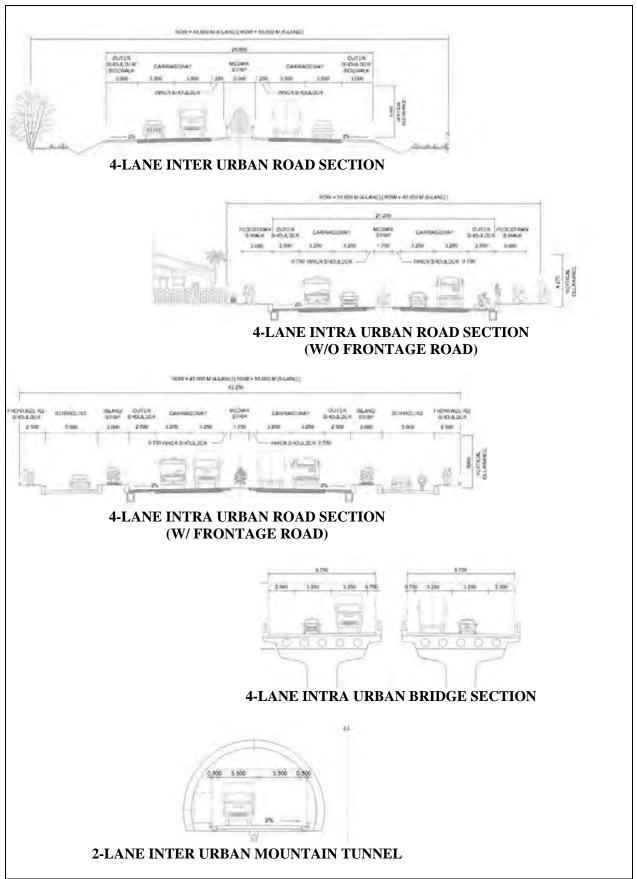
TYPICAL CROSS SECTION OF HSH-2
